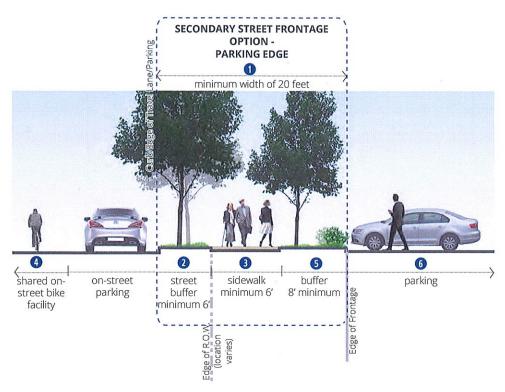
Secondary Street Frontage Option - Parking Edge
